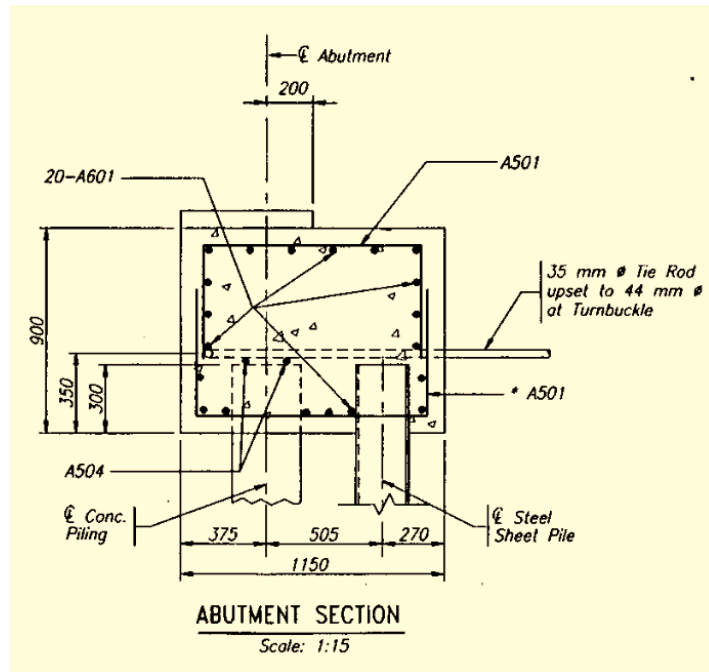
Abutment cross section of the bridge in Tarnov South, Platte County, Nebraska.
